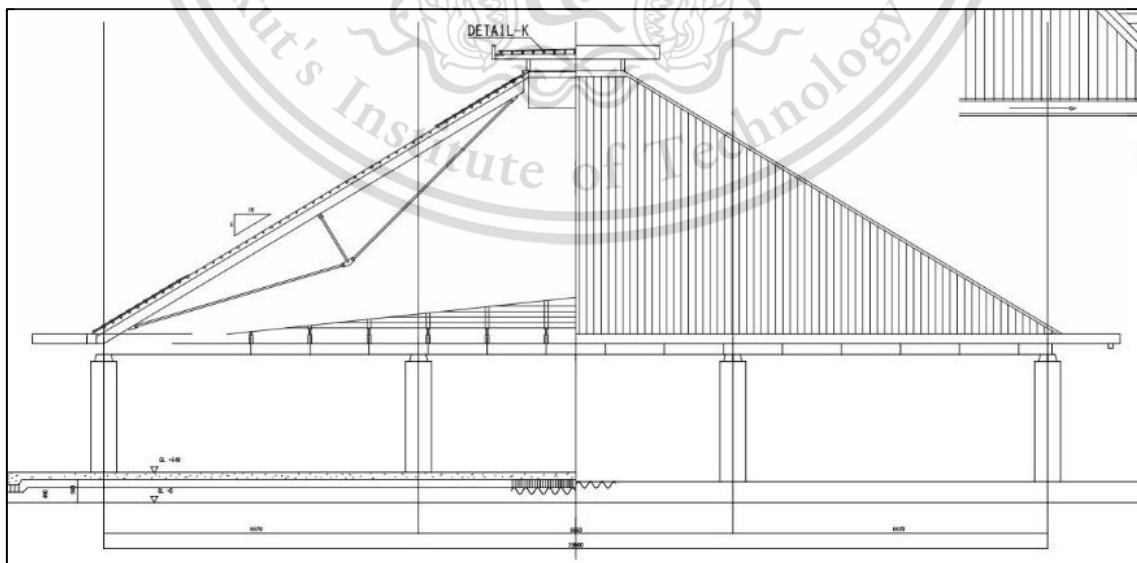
Section and elevation of cafetorium (Retouch of the original drawing)
